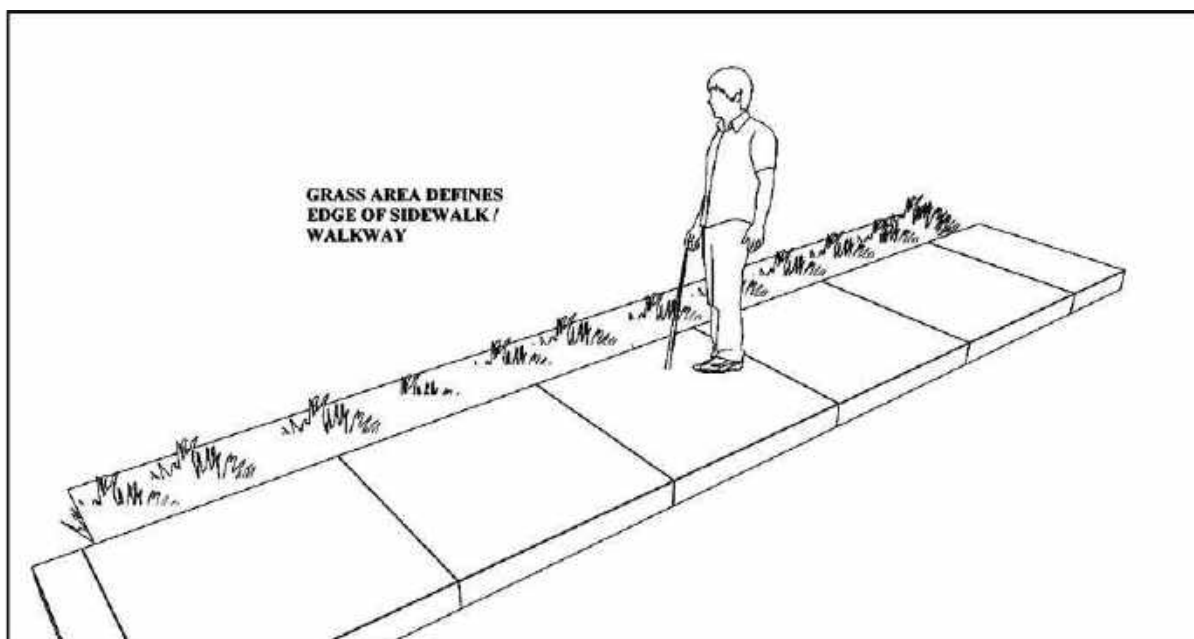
Use of Grass Area or Planting Strip to Define Inner Edge of Sidewalks/Walkways
